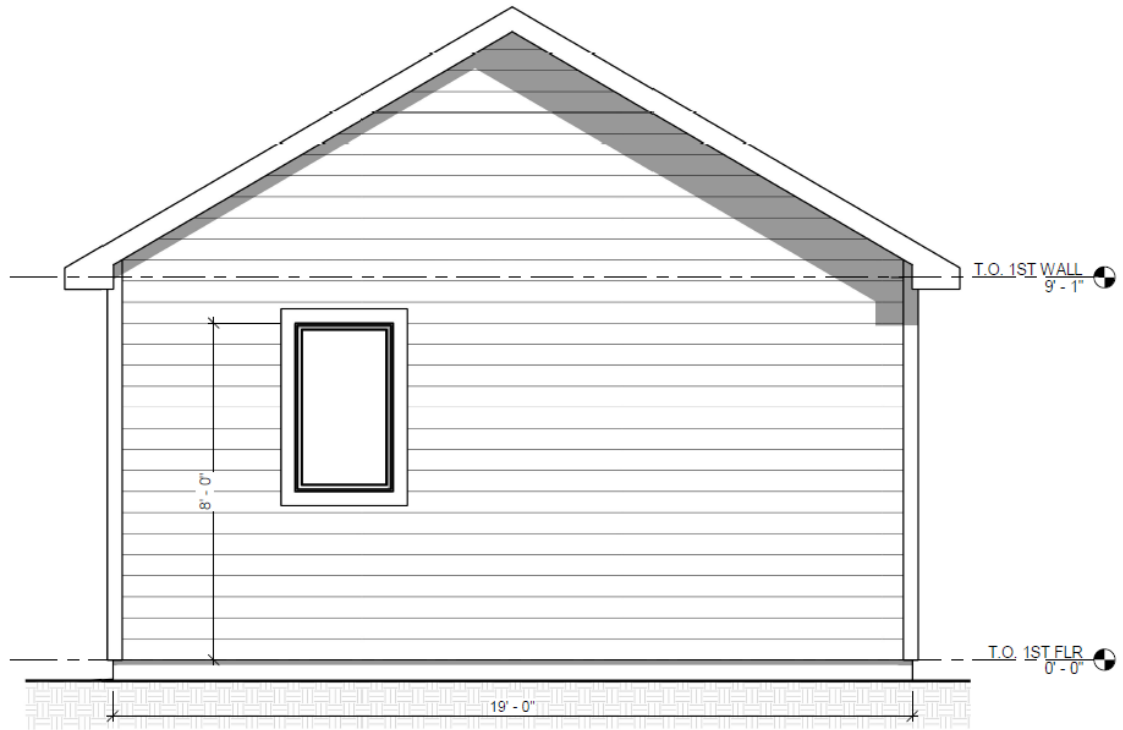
Preliminary Elevation Plan of Detached ARDU – Rear, Prepared by Groen Design
